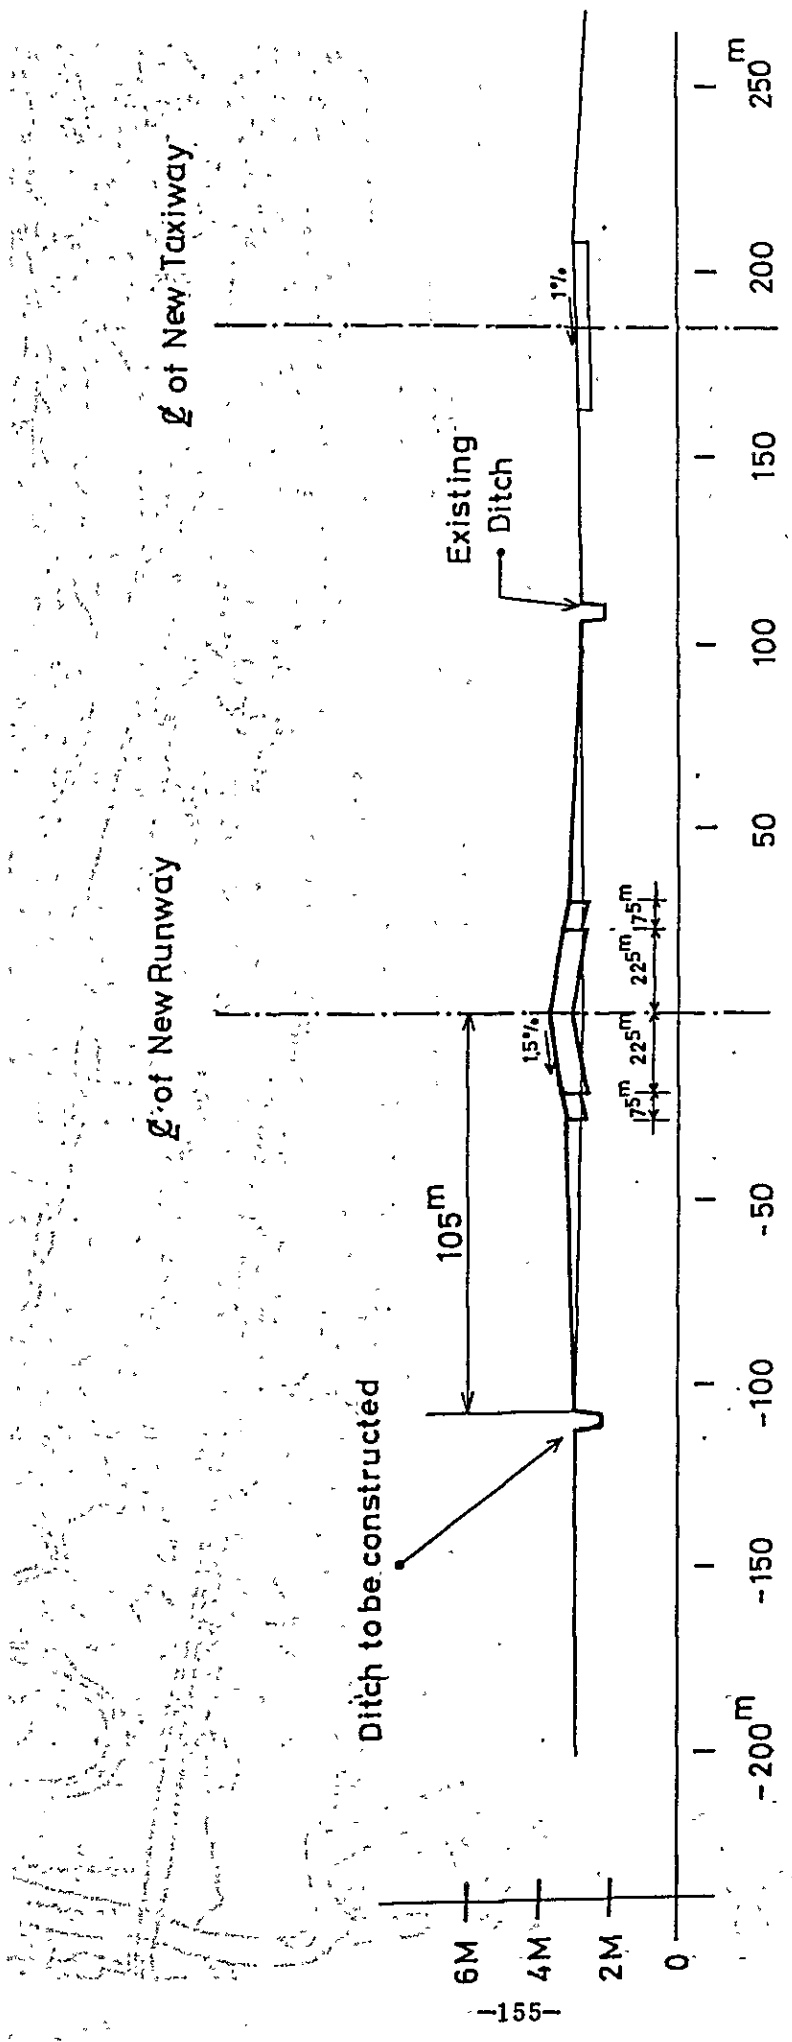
TYPICAL CROSS SECTION AT TABLING AIRPORT.
